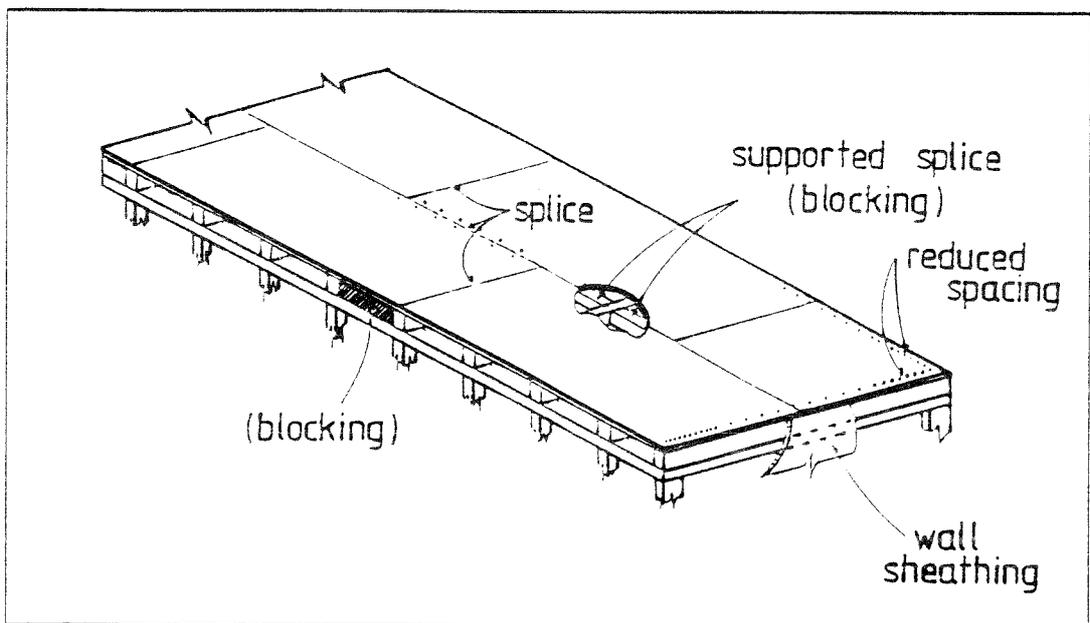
Supporting and nail-spacing in the edges of sheathing panels
